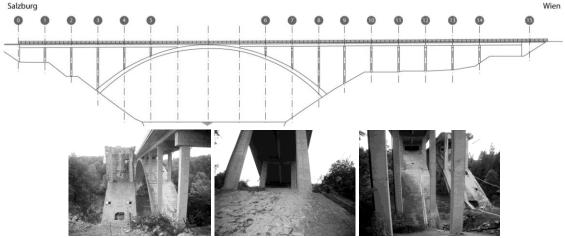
Elevation for the driving direction Vienna (top) and photo documentation (bottom) – W4 Traun Bridge Steyrermühl.
